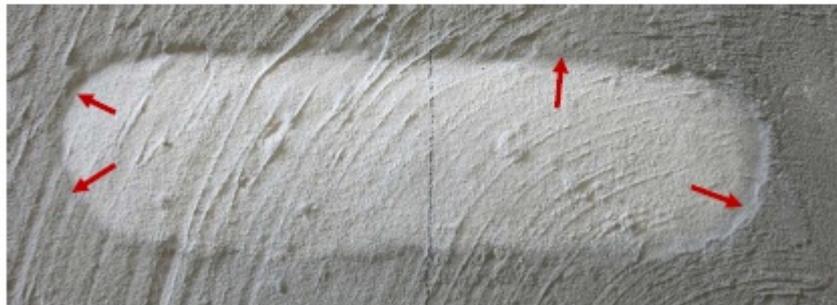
Photo. Cracking apparent on top of deck at grout pocket near west end of test specimen prior to start of structural loading.
